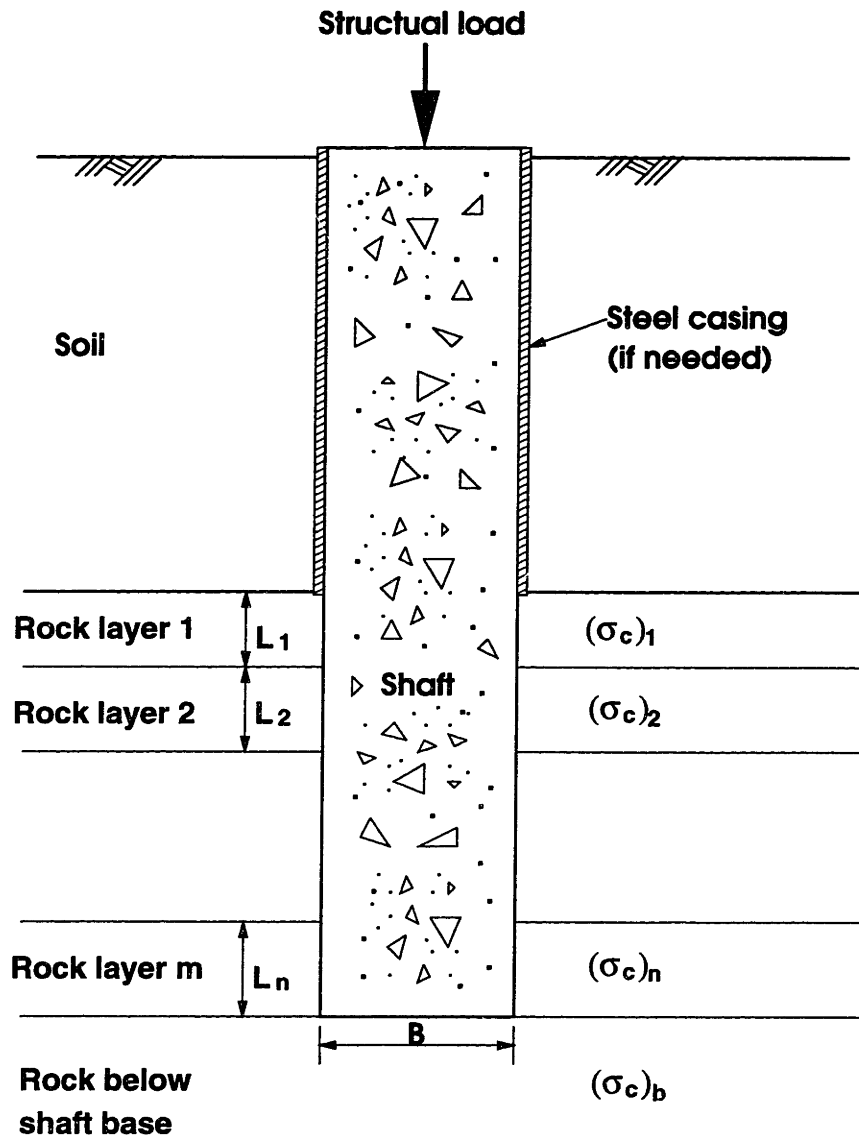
A drilled shaft socketed into a multi-layered rock mass.
